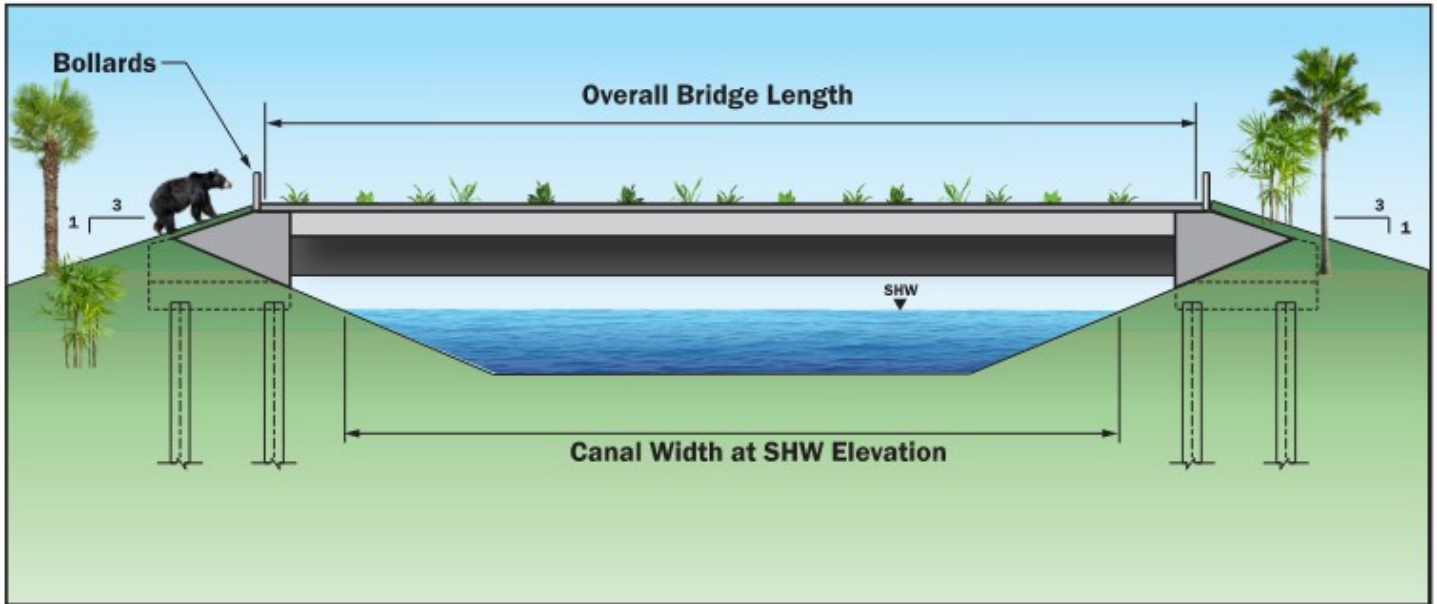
Profile view of a canal crossing with a concrete Florida I-Beam (FIB) design, pile supported substructure and parapets to retain a layer of soil for a natural walking surface.
